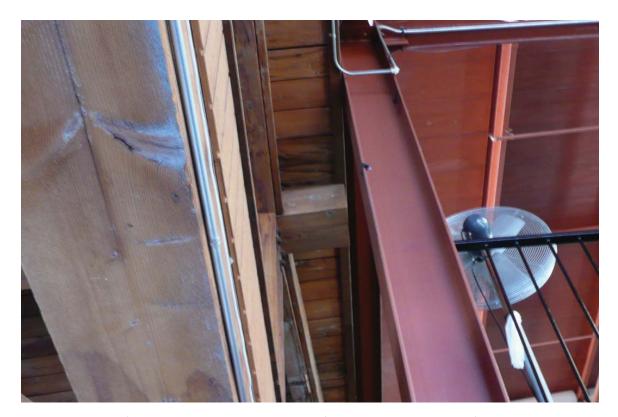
Detail of the truncated wood horizontal roof and structural members of the northern shed and the steel structural system of the 1980s addition (ARG September 2009).
